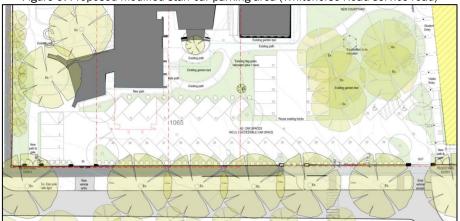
Proposed modified staff car parking area (Whitehorse Road service road)
